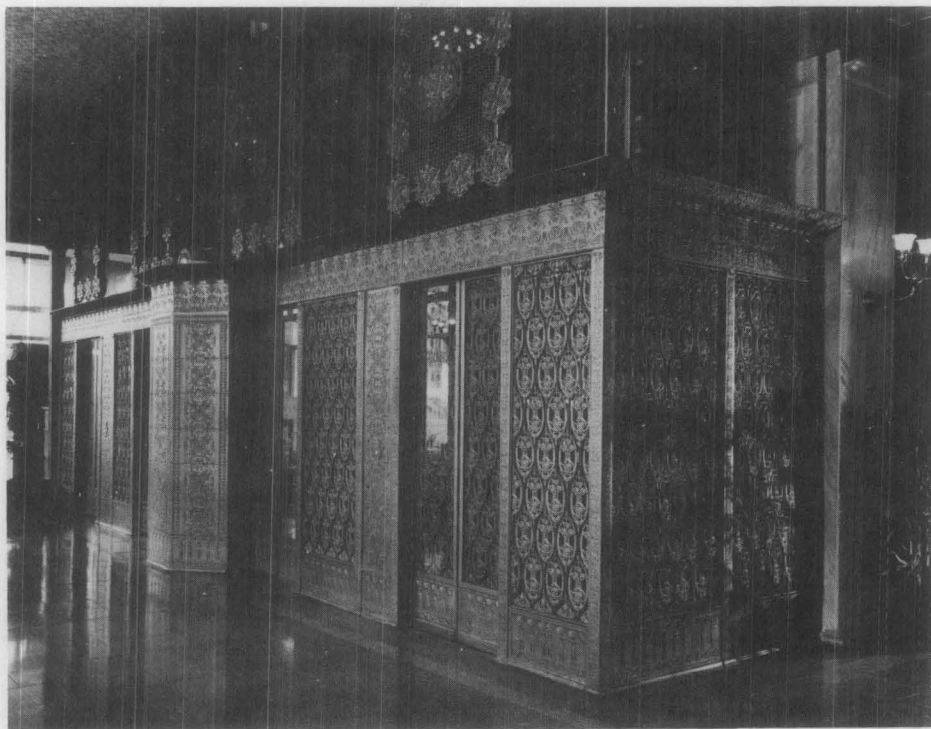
First floor elevator lobby as restored, 1984, showing the replicated cast ornament on the elevator enclosure, with sprinkler heads discreetly placed to protect elevator cabs. The elevator door far left (number 4) is inoperable since the cab and equipment had been removed in 1962. Photo: Patricia Layman Bazelon.
